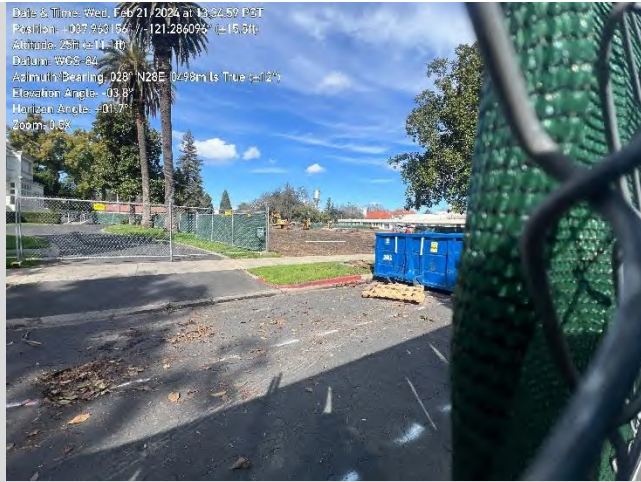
View facing northeast at the area between Building 1 and Building 4.
